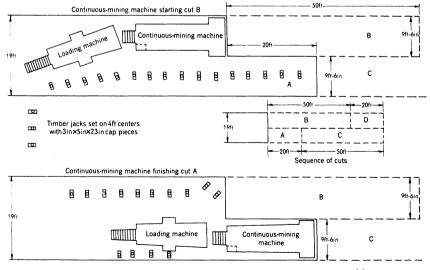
Timbering plan and sequence of cuts at Mine 18.⁽³⁾
